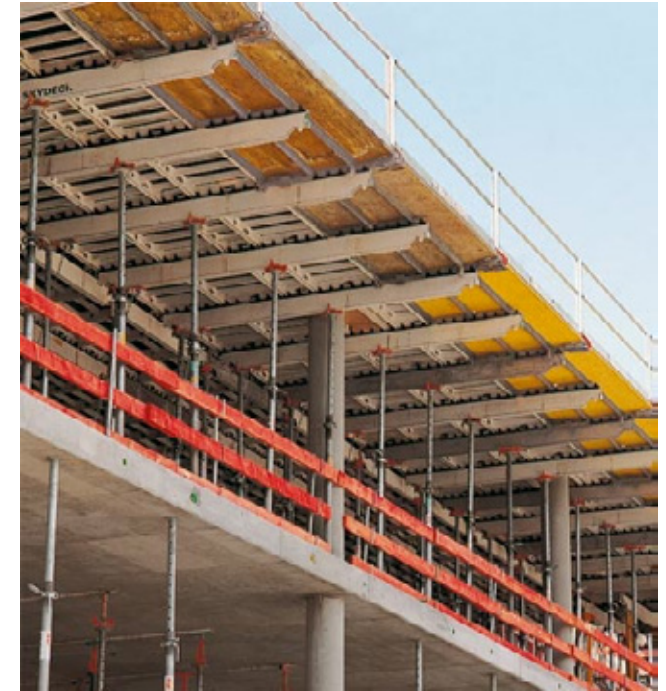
Aluminium Beams of PERI SKYDECK can be cantilevered by 1.3m with a permissible load of 150 kg/m<sup>2</sup>
